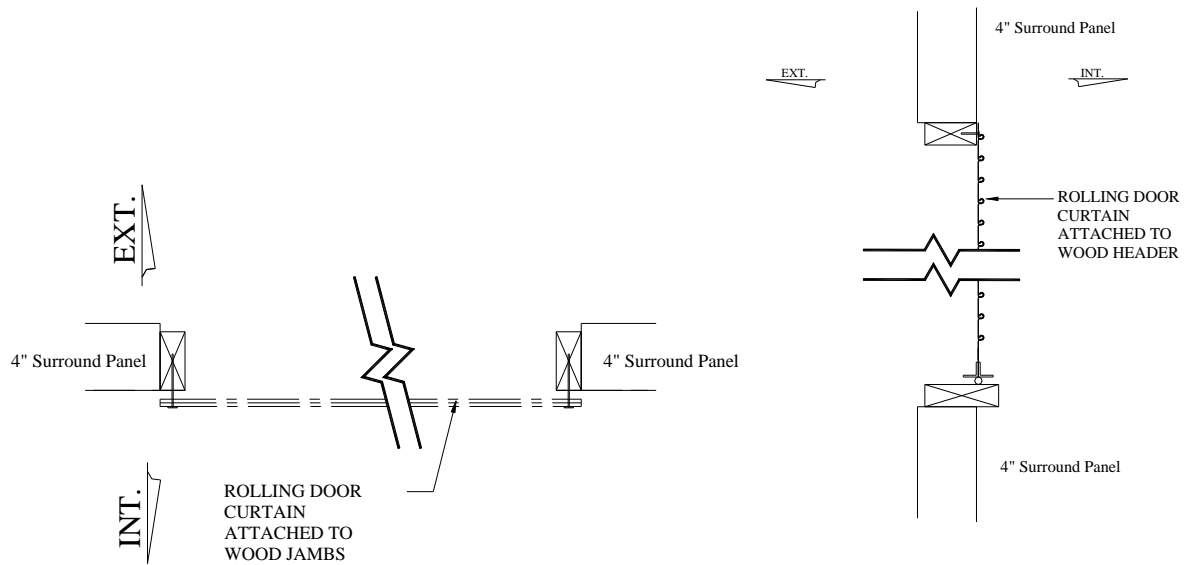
Rolling Door Front Elevation View and Perimeter Details
